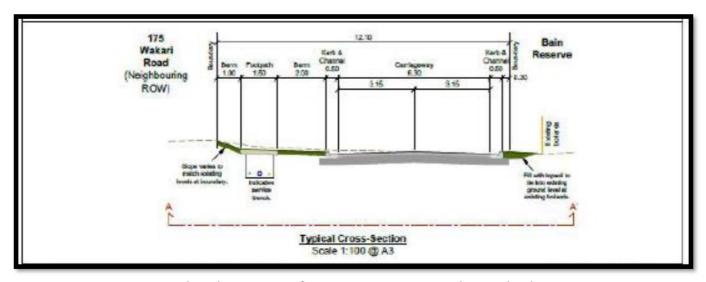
Typical Road Cross-Section for Access Between #175 Wakari Road and Bain Reserve
